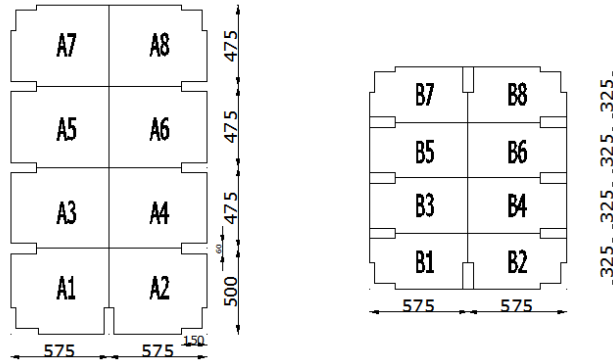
Dimensions (in mm) of the precast concrete panels for both floors.
